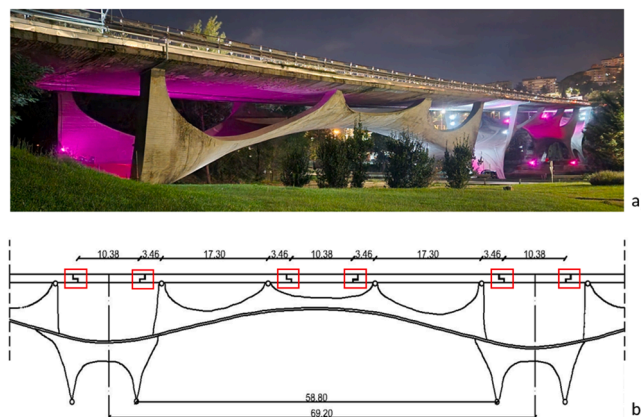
Musmeci Bridge’s overview (a) and structural scheme of a span (b) (dimensions in m).
